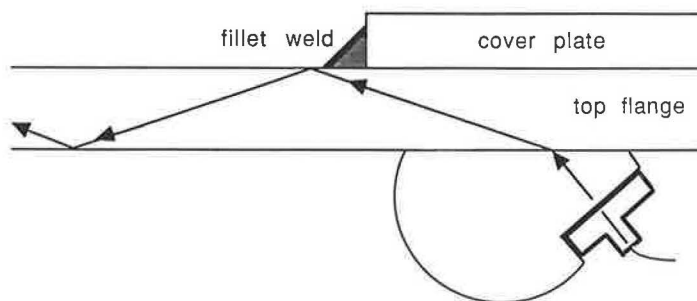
Inspection at end of welded cover plate: scan of cover plate end.
